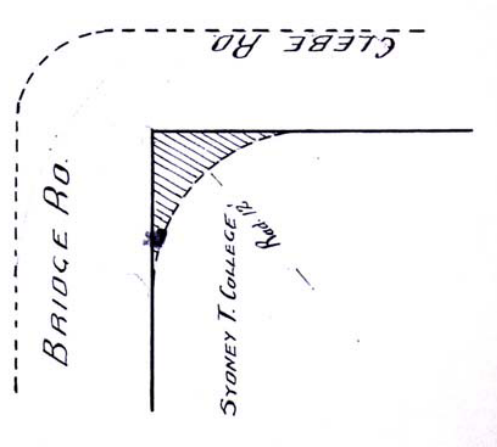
Sketch of proposed 'rounding off' of *Hereford House* grounds in 1927. The result of this proposal can be seen in the 1935 photo at Figure H18, where the corner was built at a 45° angle.
